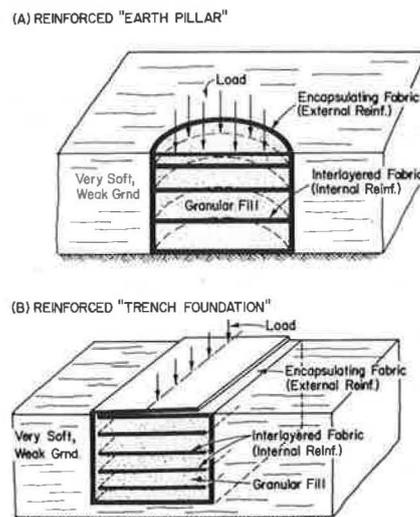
Internally/externally, fabric reinforced below grade foundations.
